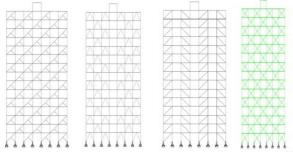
Elevation View of K, V, diagonal and Xtype of bracing.
